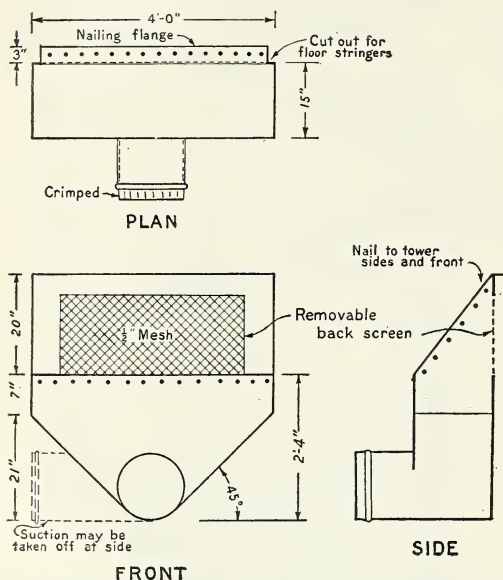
Plan and elevations of bottom funnel for ground-level tower.
